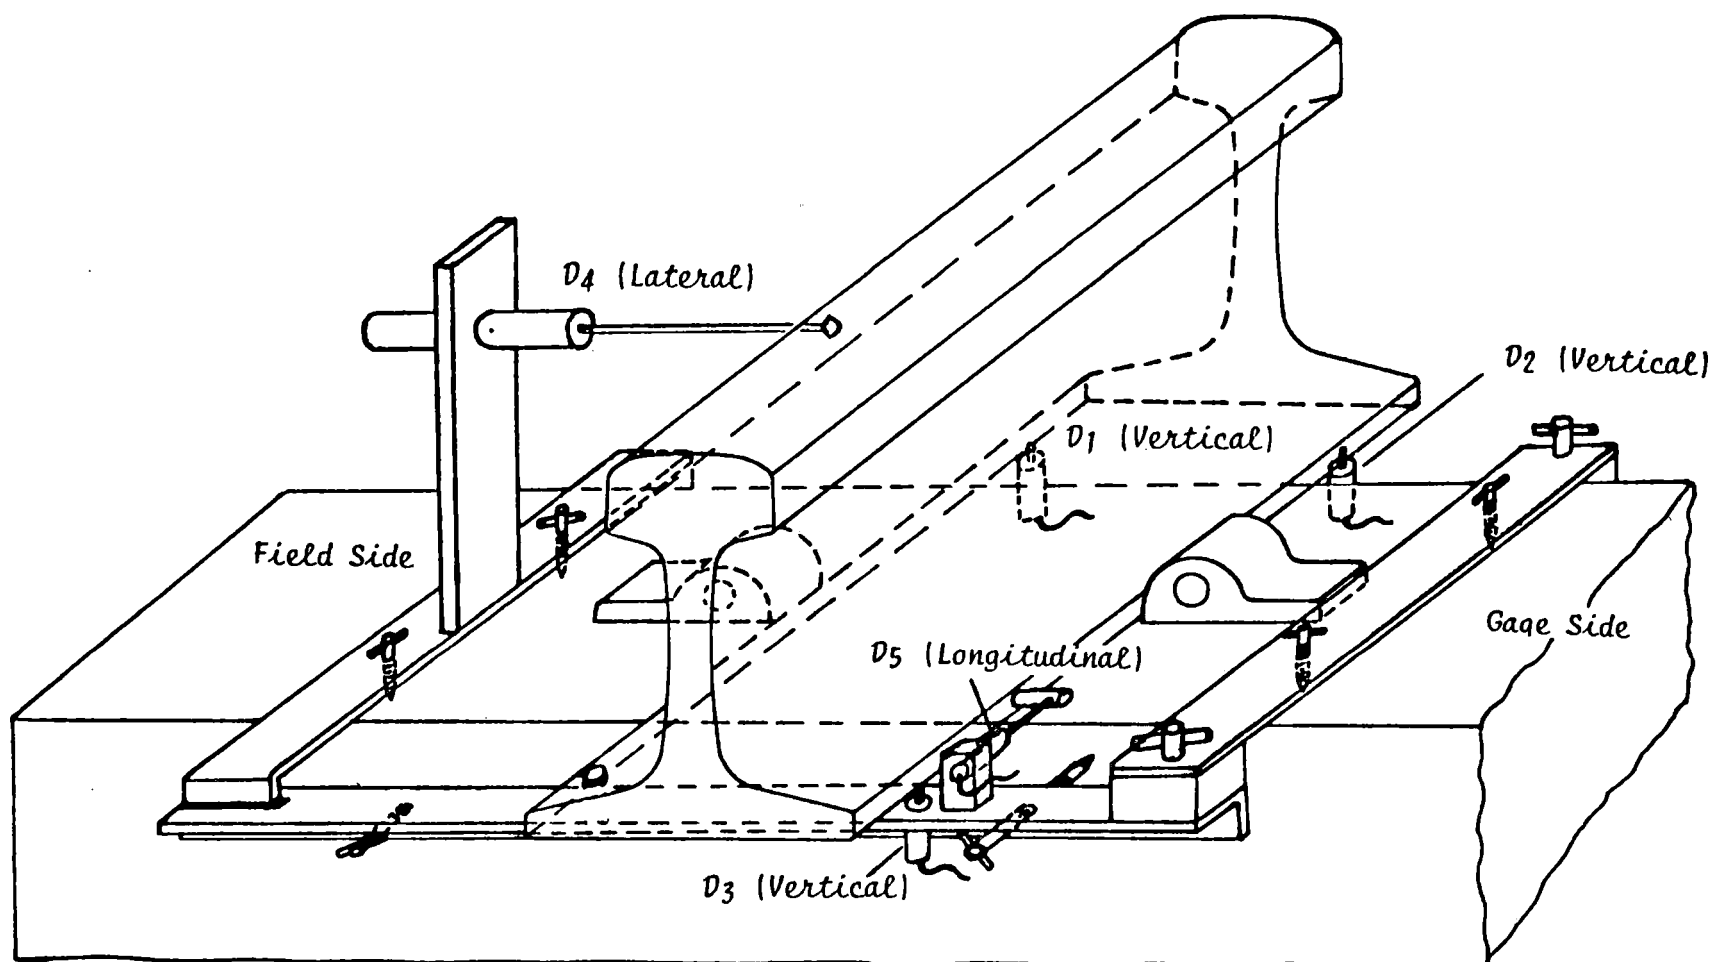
FIXTURE FOR MOUNTING RAIL/TIE DISPLACEMENT TRANSDUCERS
